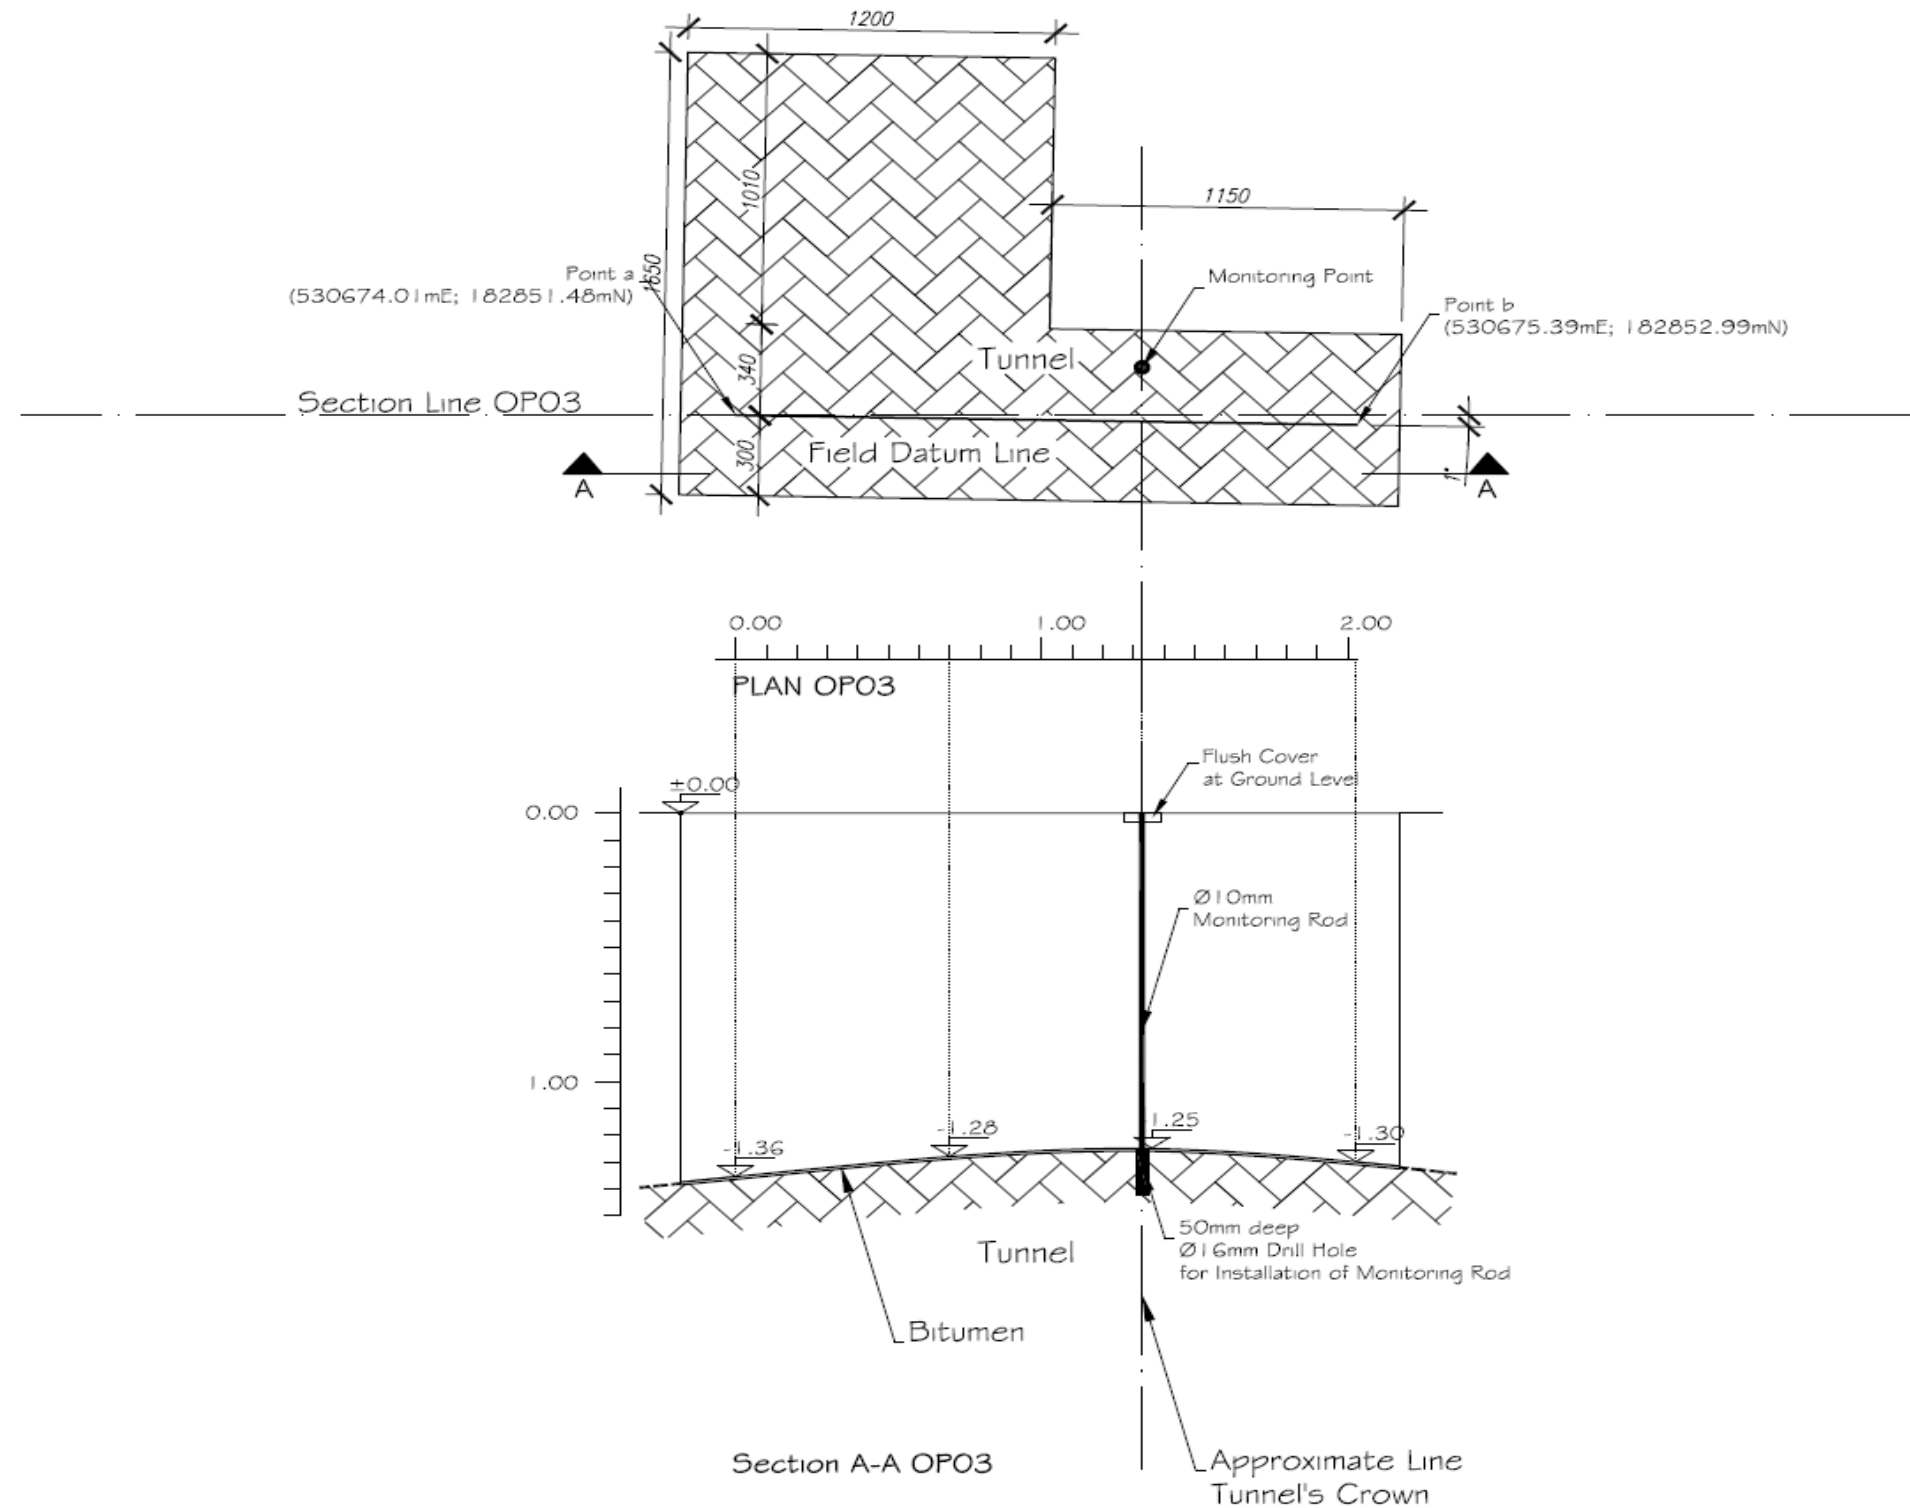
Plan and section through trial pit OP03 (Concept Site Investigations 2011) – Not to scale
